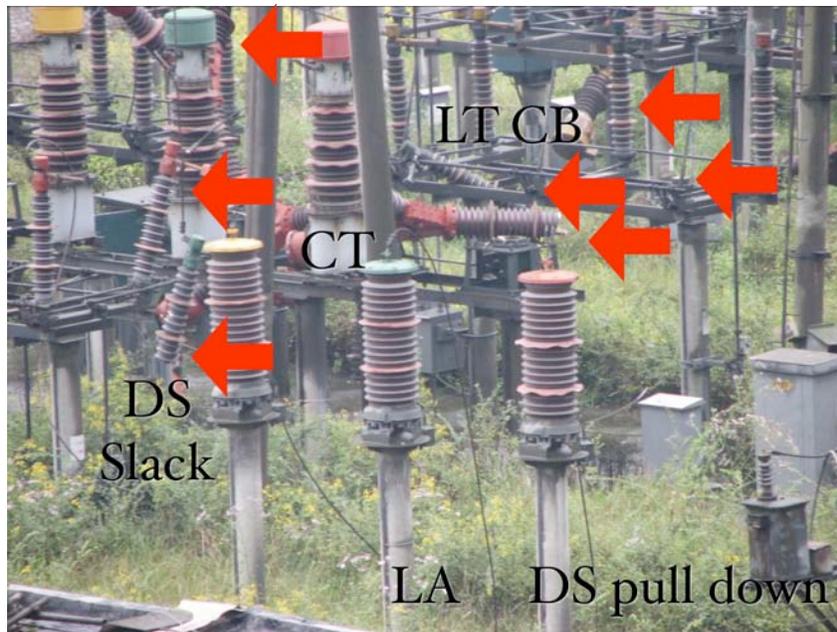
Examples of damage to Yard Equipment, Yingzhou 110 kV Substation
